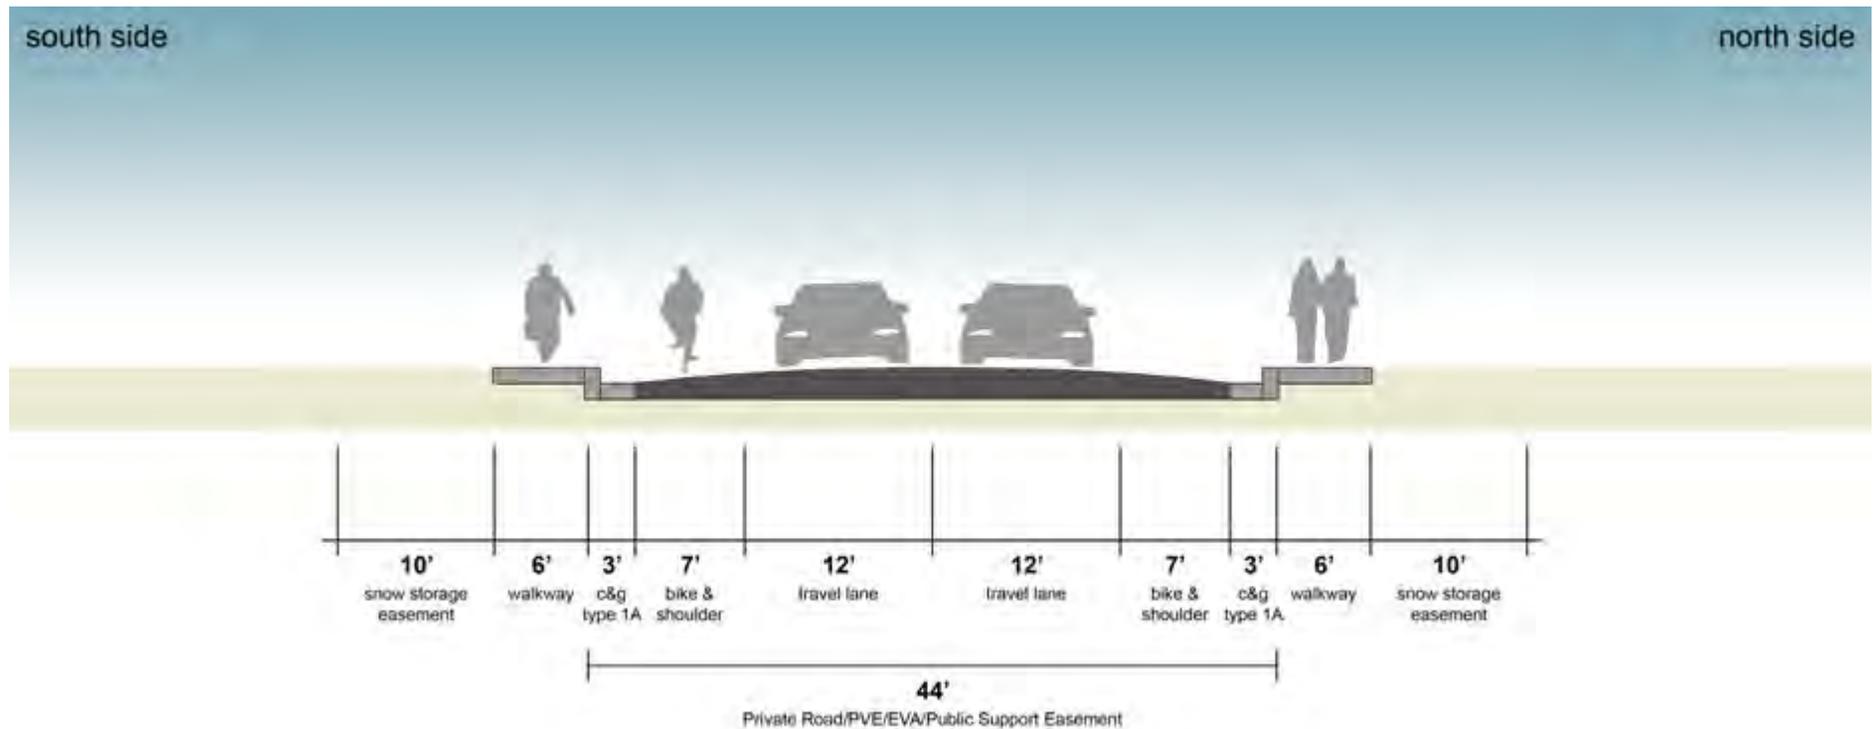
SECTION F: SECONDARY ROAD Corrected
